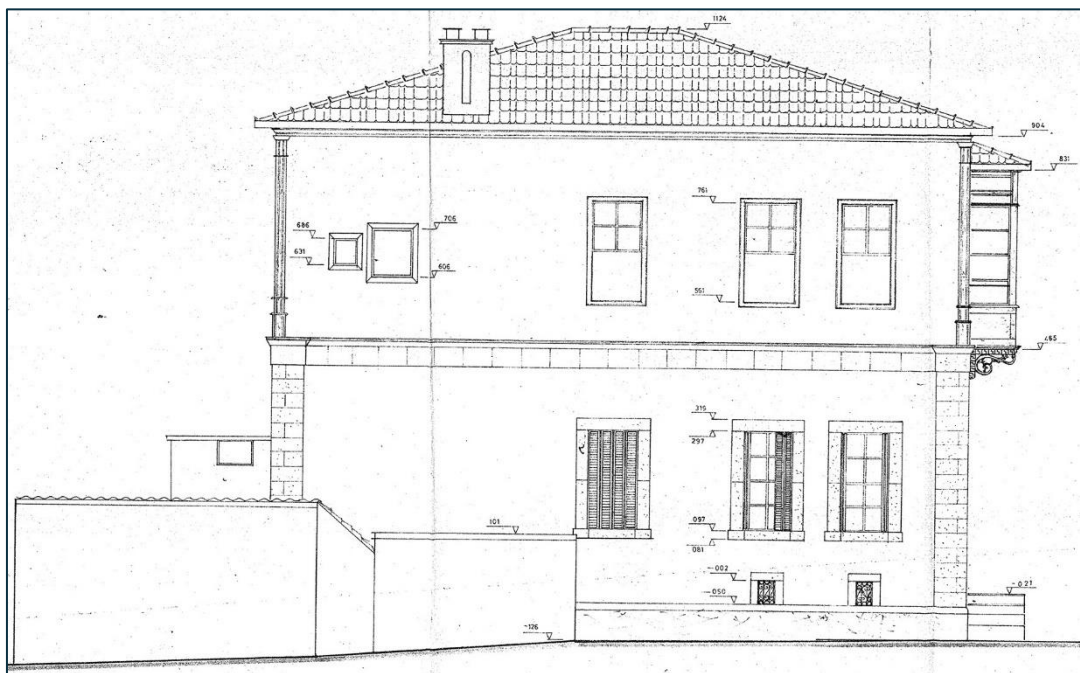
The southwest elevation of Building B. Retrieved from the official documentation drawings of Building B.
